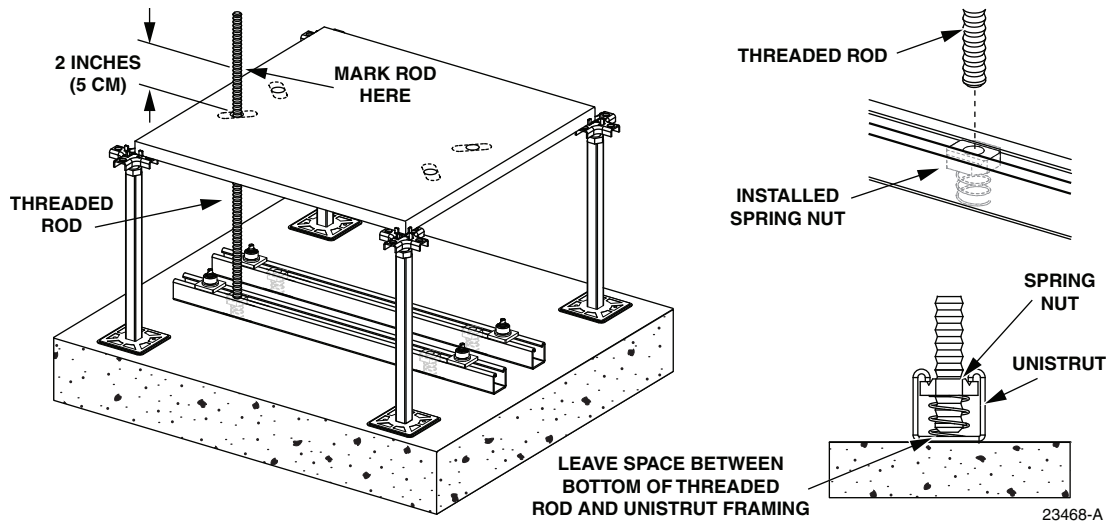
Securing Unistrut Framing To Floor With Concrete Anchor
